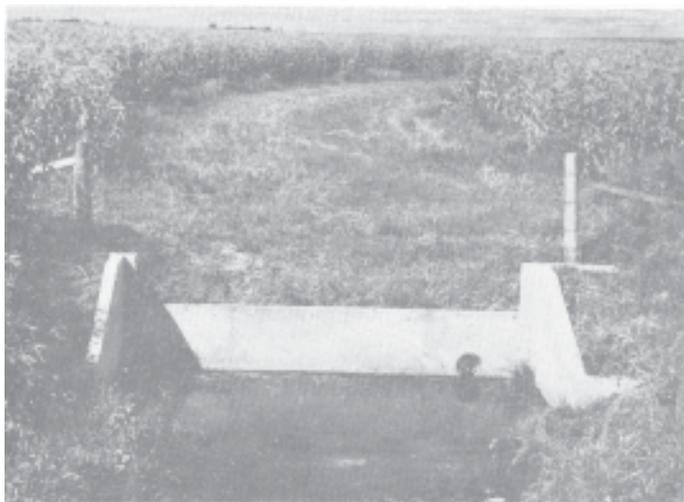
Drop box inlet structure that provides a safe outlet for runoff from the grassed waterway above and for the two outlets of a tile system.
